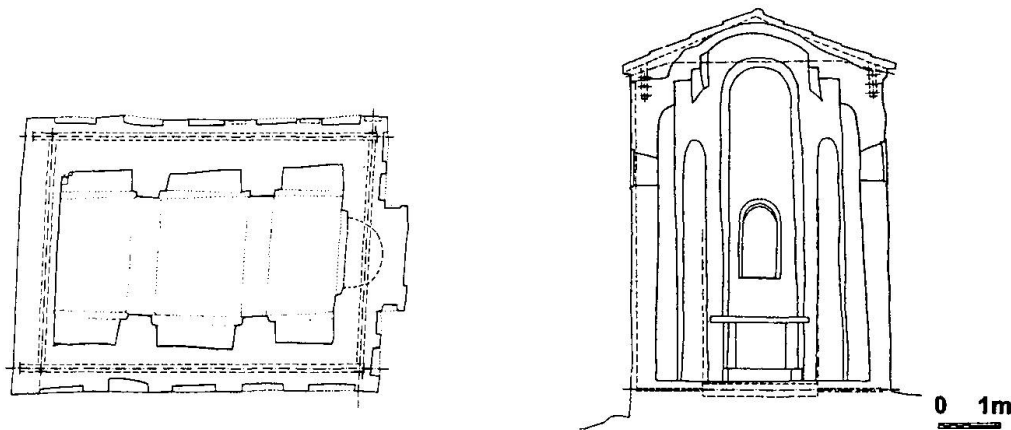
Strengthening of the church of St. Mihajlo: plan (left) and section (right)
